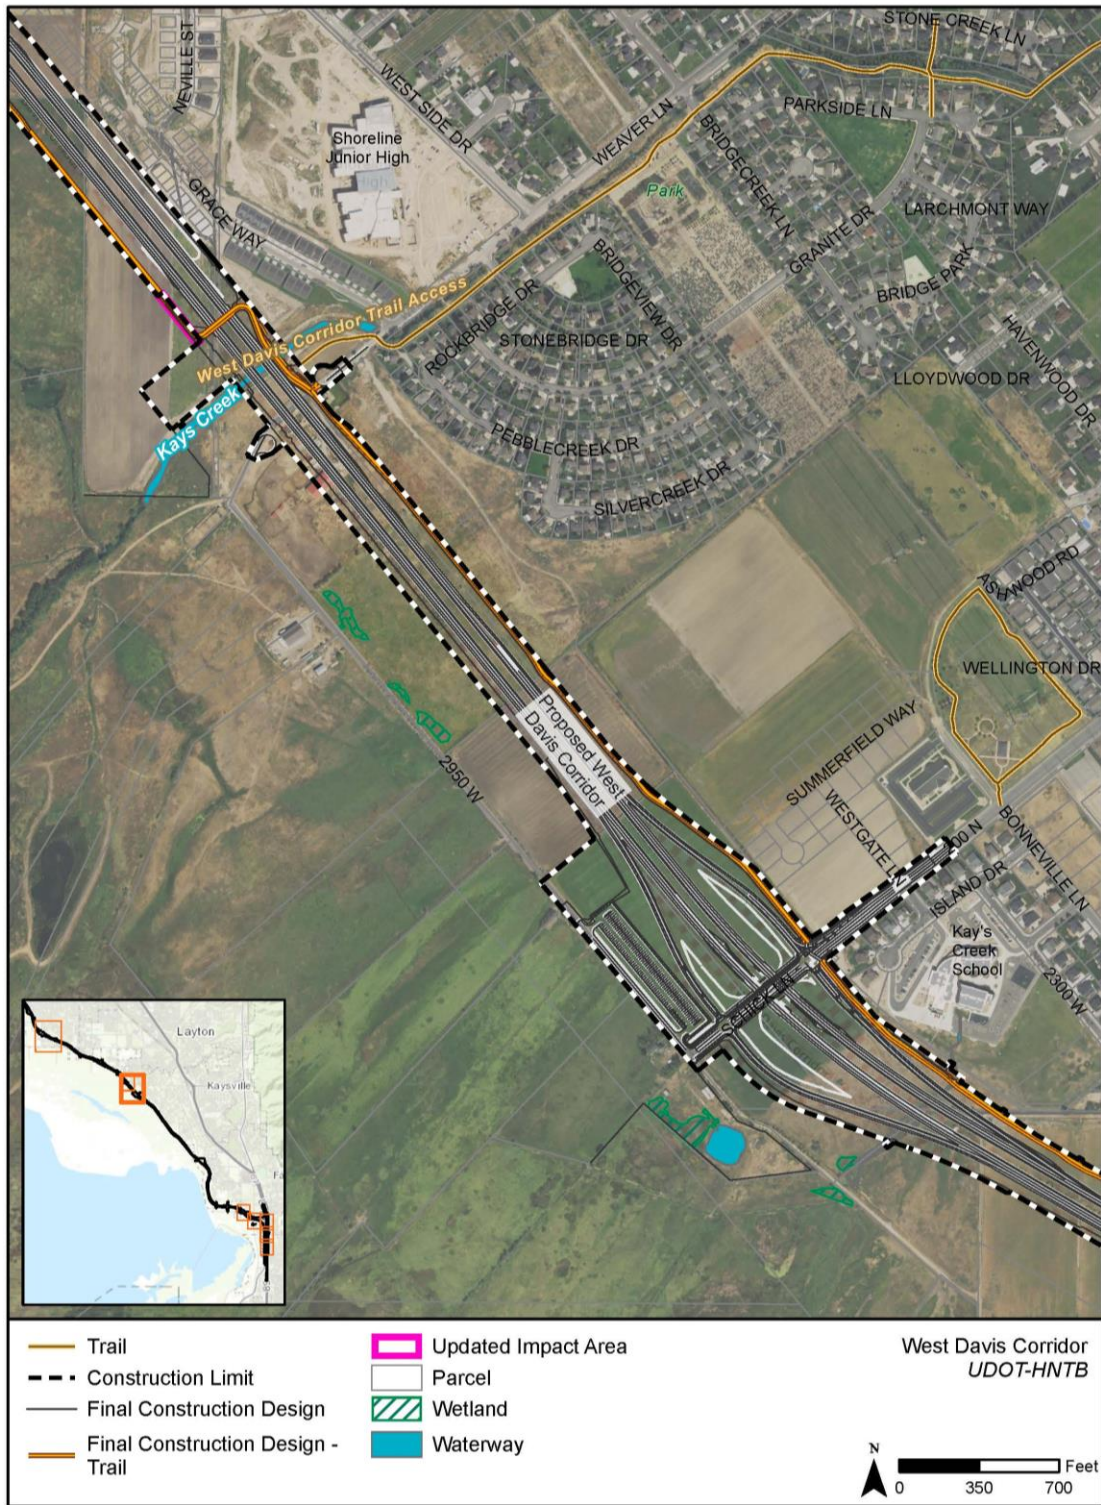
Final Construction Design Location and Design Changes to Previously Evaluated Alternatives
